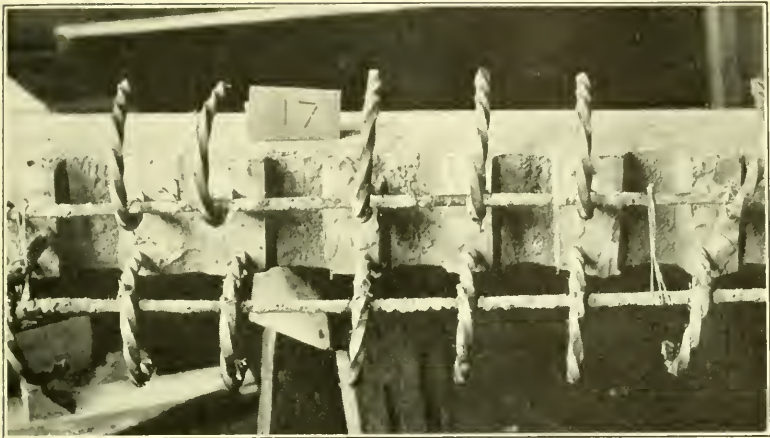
TOP OF STEM OF BEAM NO. 17, SHOWING A "CORRUGATED" JOINT.
